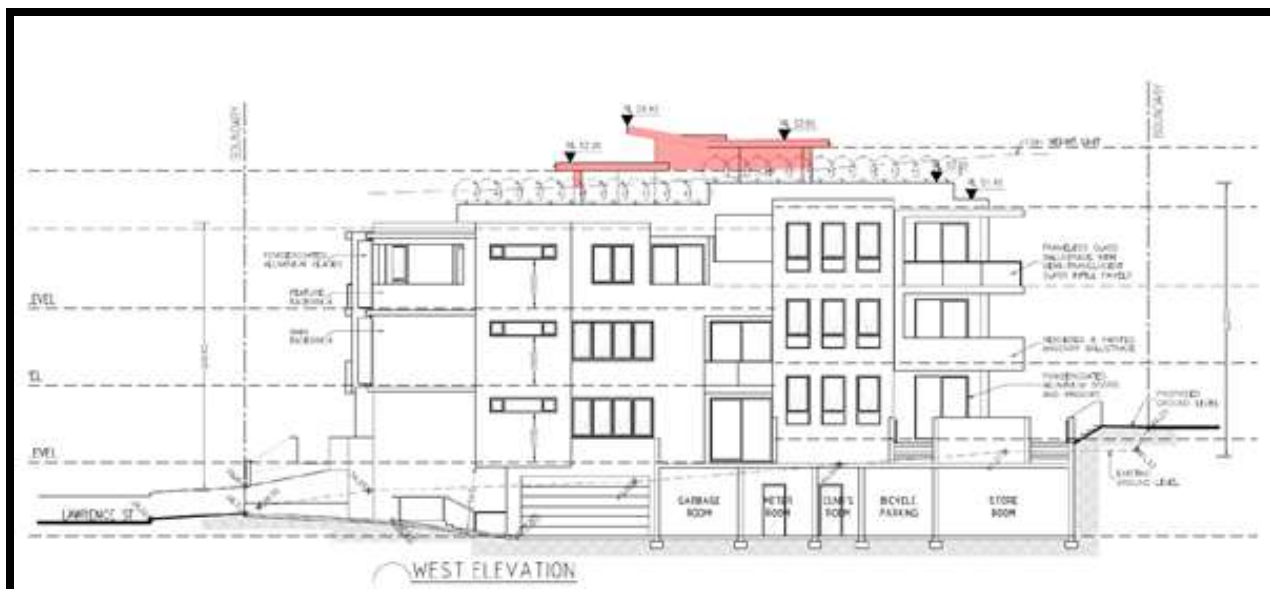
Western elevation of the building illustrating area of non-compliance with the height control in red (Source: Planning Ingenuity, 2018)
